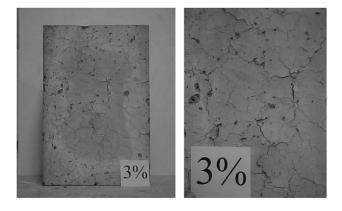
Exposed surface of rubber-filled HSC specimen with 3% of rubber after fire test. General view and detail.
